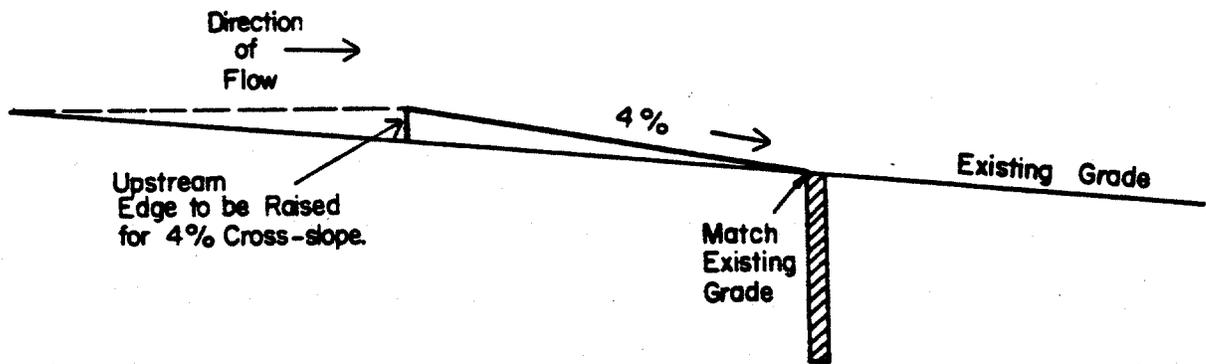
VI : Dip Crossing Design With A 4% Cross-Slope
